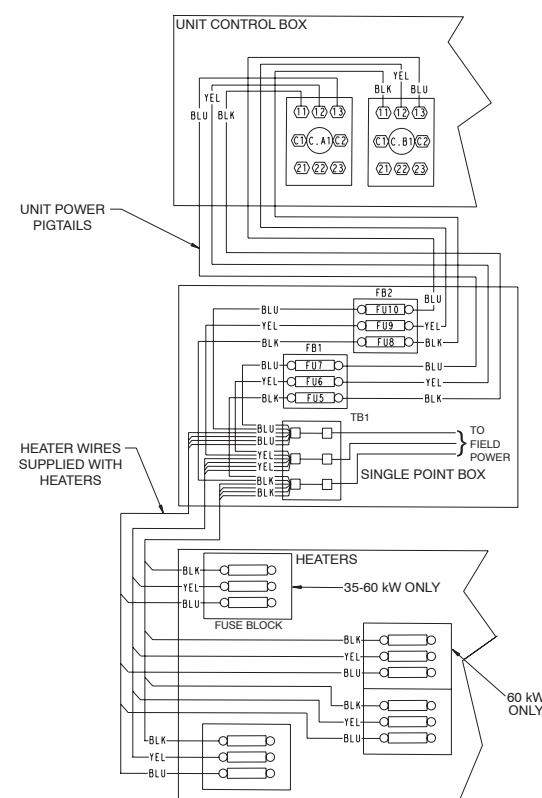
Heater Wiring CRSINGLE031A00, 35–50 kW
